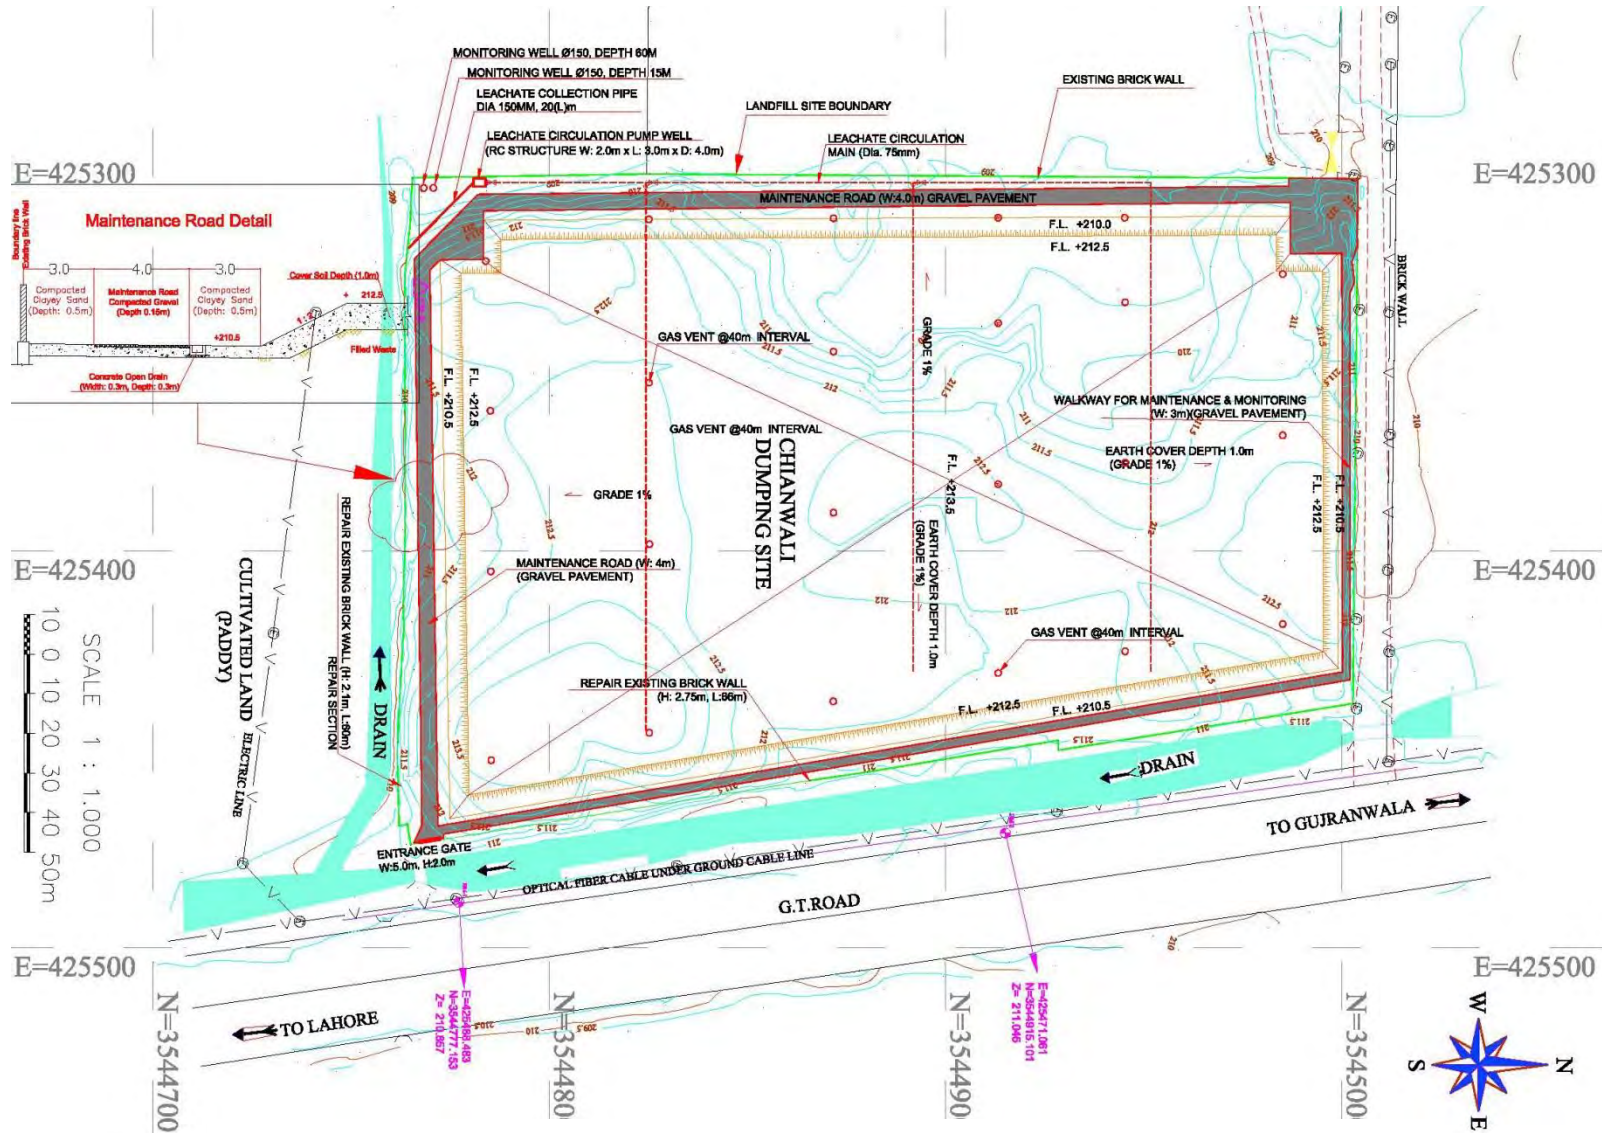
Layout Plan of Safe Closure Work at Chianwali Former Disposal Site
